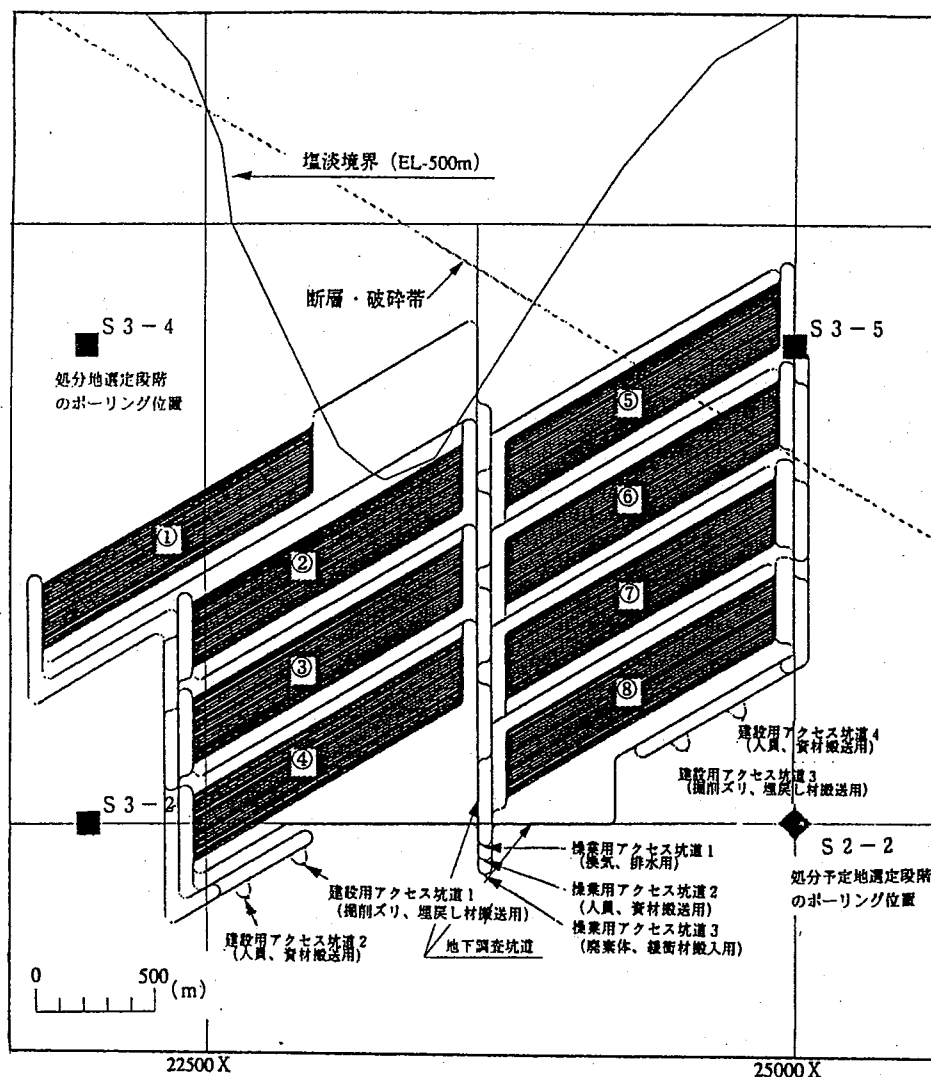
Detailed plan of facility layout in area of sedimentary rock formation (vertical emplacement method)
